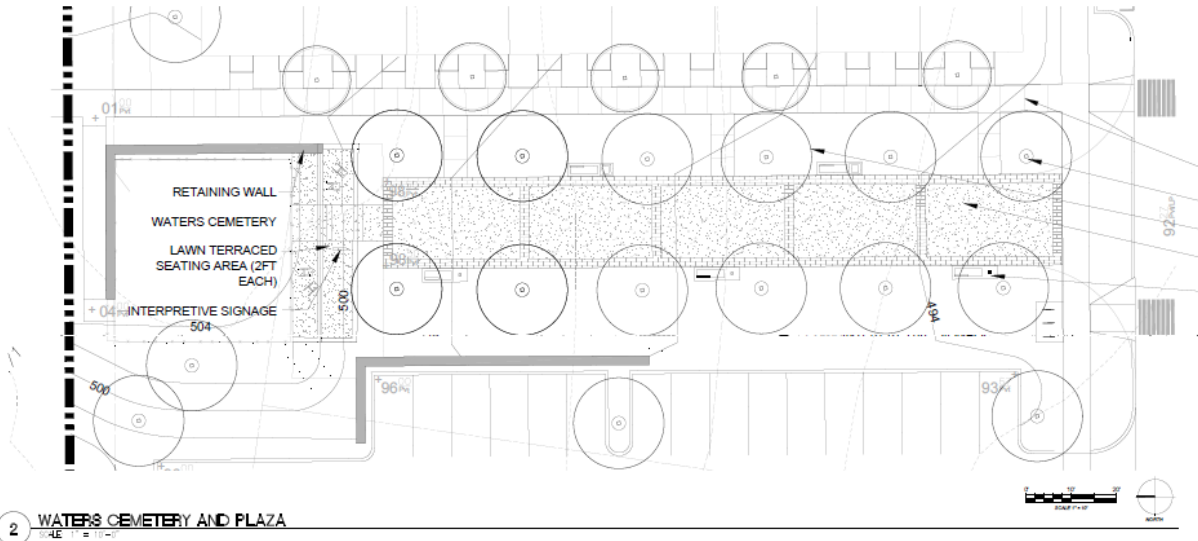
Proposed plantings, retaining walls, pavements in Waters Park.
